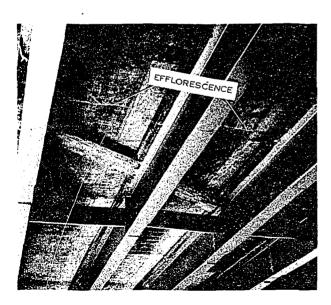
Transverse cracks. Note cracks are near inflection point, and are transverse even though deck is skewed. Note efflorescence.
